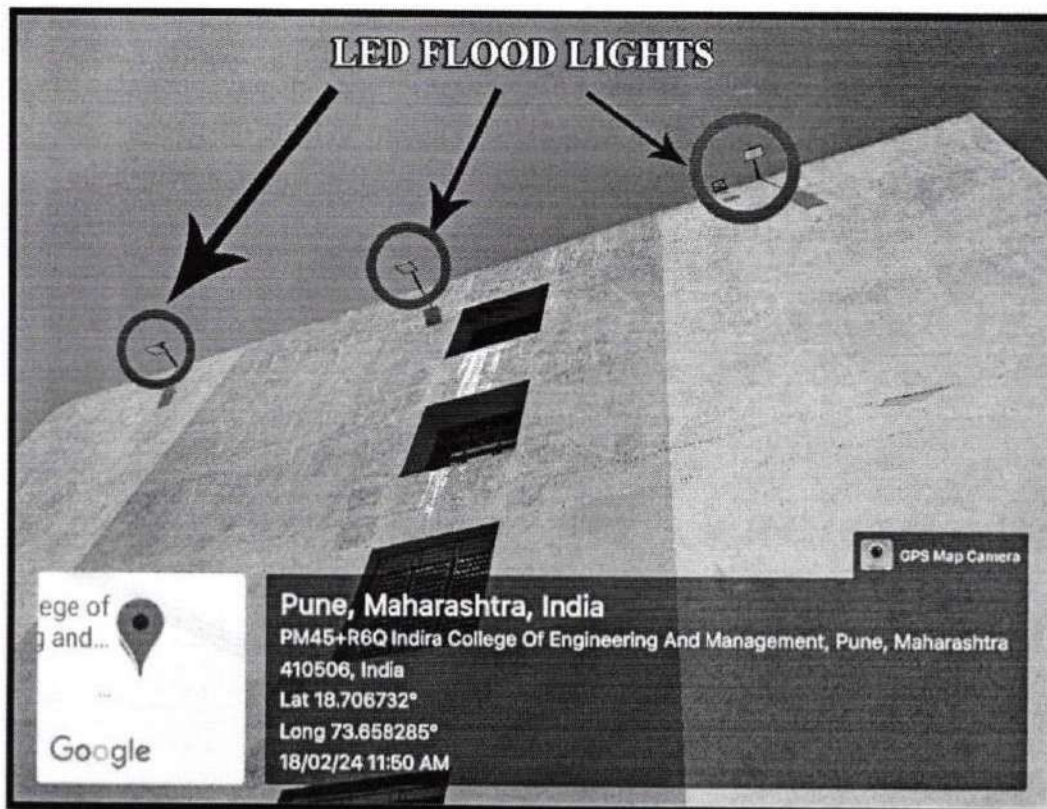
LED Flood Lights at A Building above Volleyball Ground
